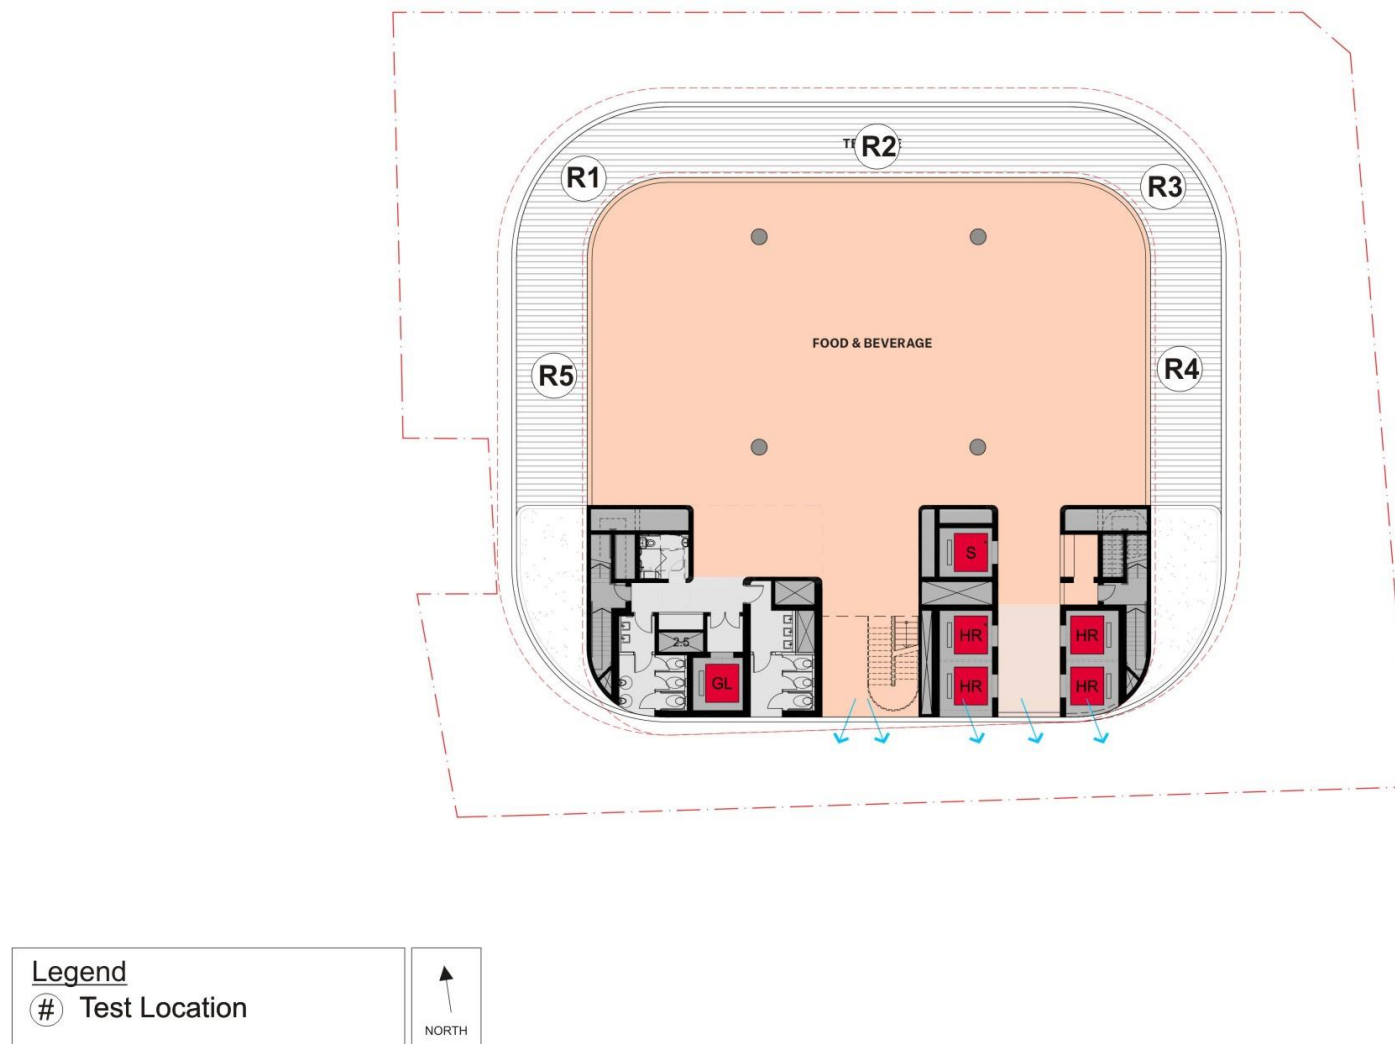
Rooftop Terrace Test Locations of the 15-23 Hunter Street and 105-107 Pitt Street Development, Sydney.
